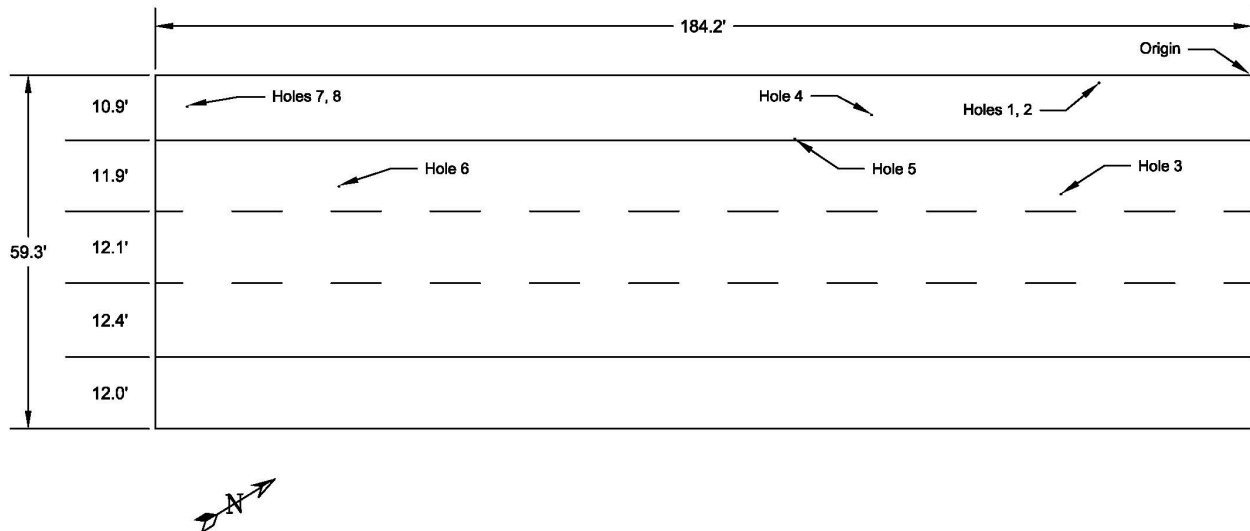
Typical random sampling plan for concrete bridge deck testing.
